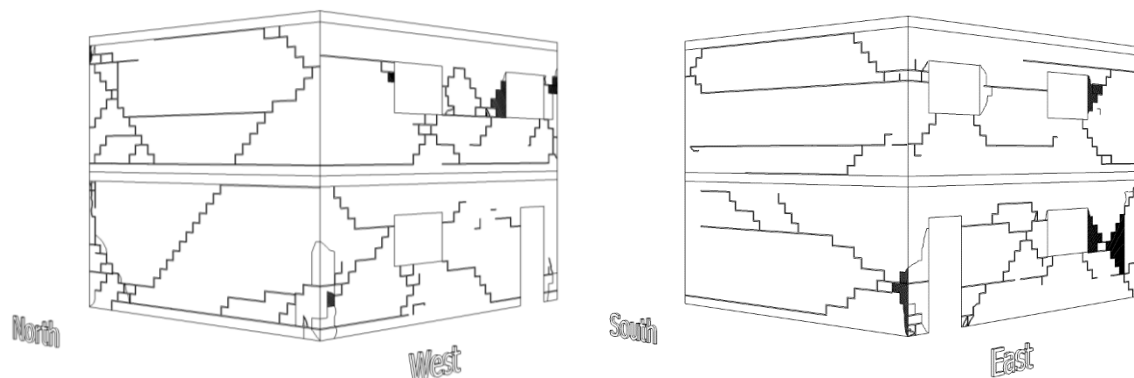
Final damage for the experimental unreinforced masonry building
